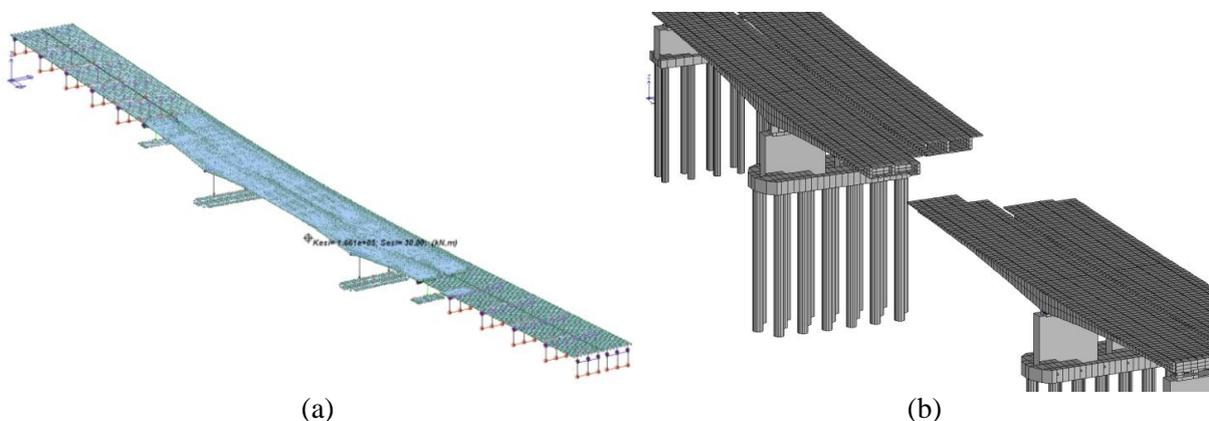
(a) Axonometric view of the FE model provided with the isolation system, and (b) axonometric view and detail of deck, piles and foundation.
